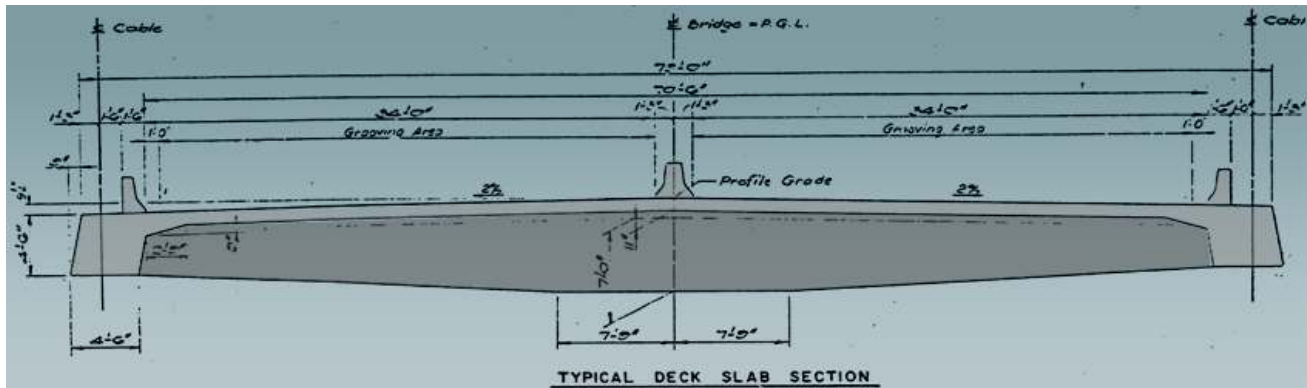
A section through a 28.25', 300 ton, cast-in-place, cable-stayed, typical segment.
